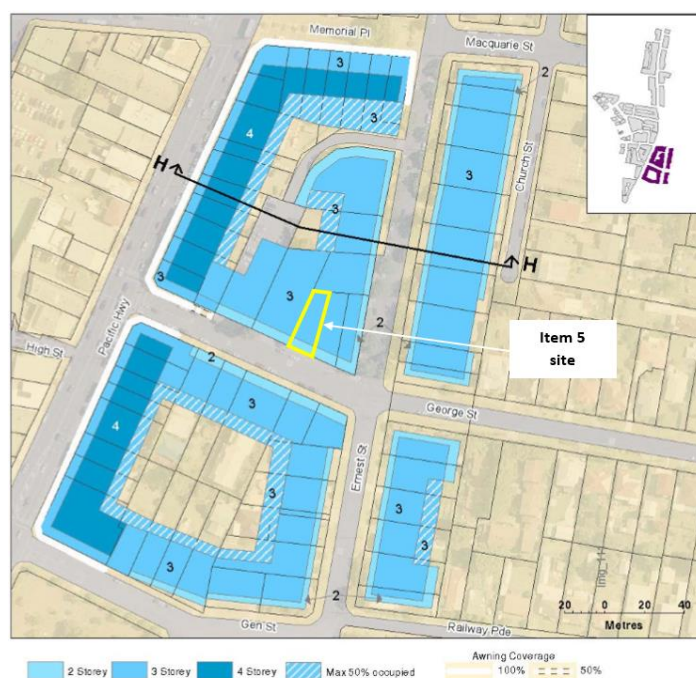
Block H Control Plan Part 10 Town Centre Area Plan - Belmont (source: LMCC DCP).
